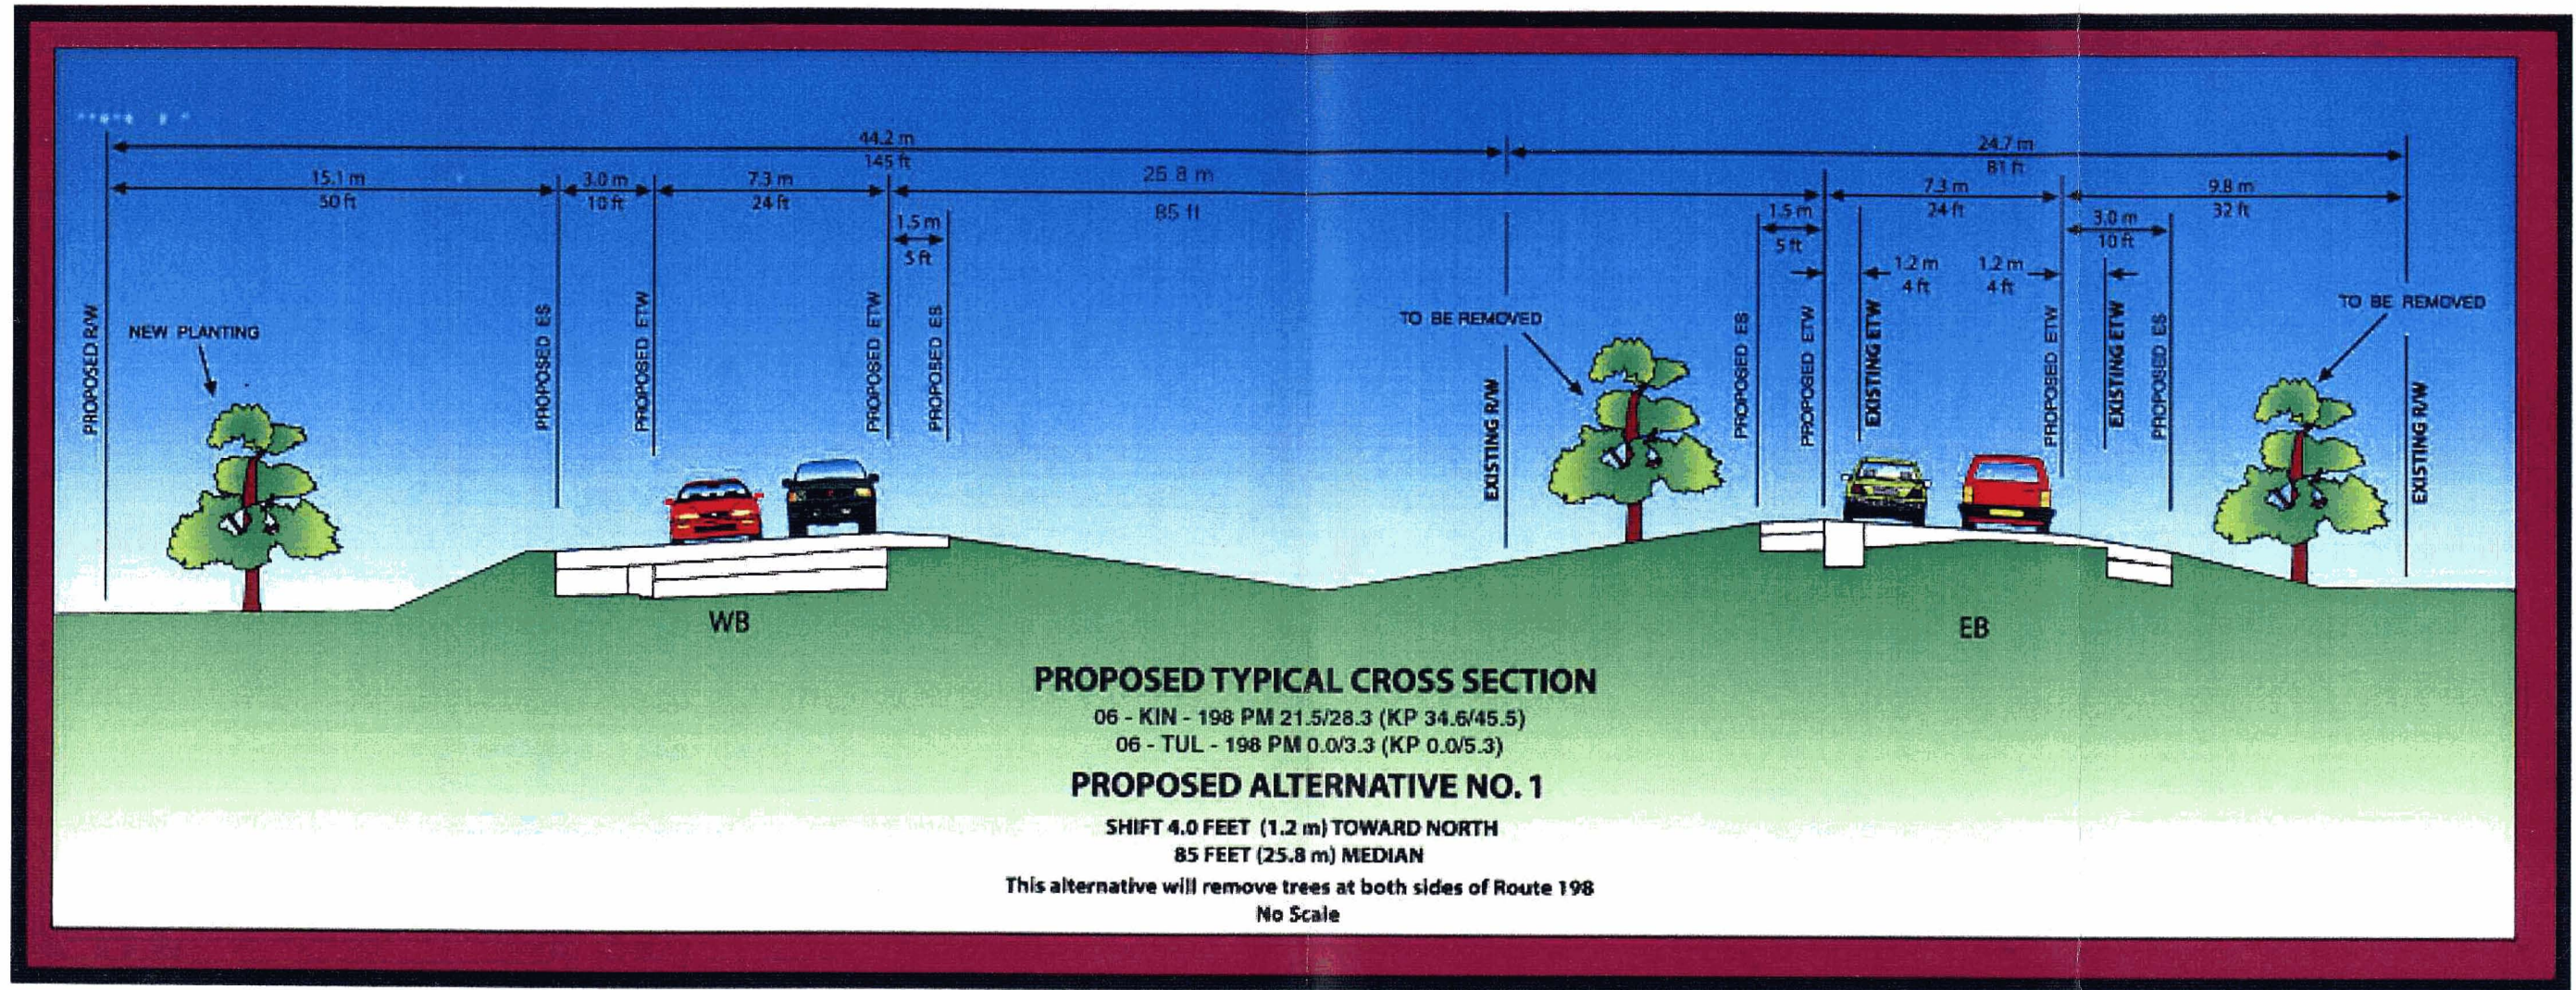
Proposed Typical Cross Section – Alternative 1
